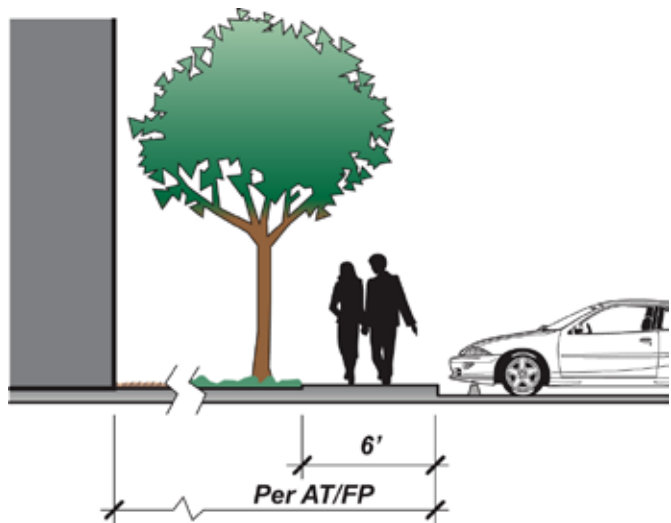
Typical parking setback to allow for walkway and landscaping.
